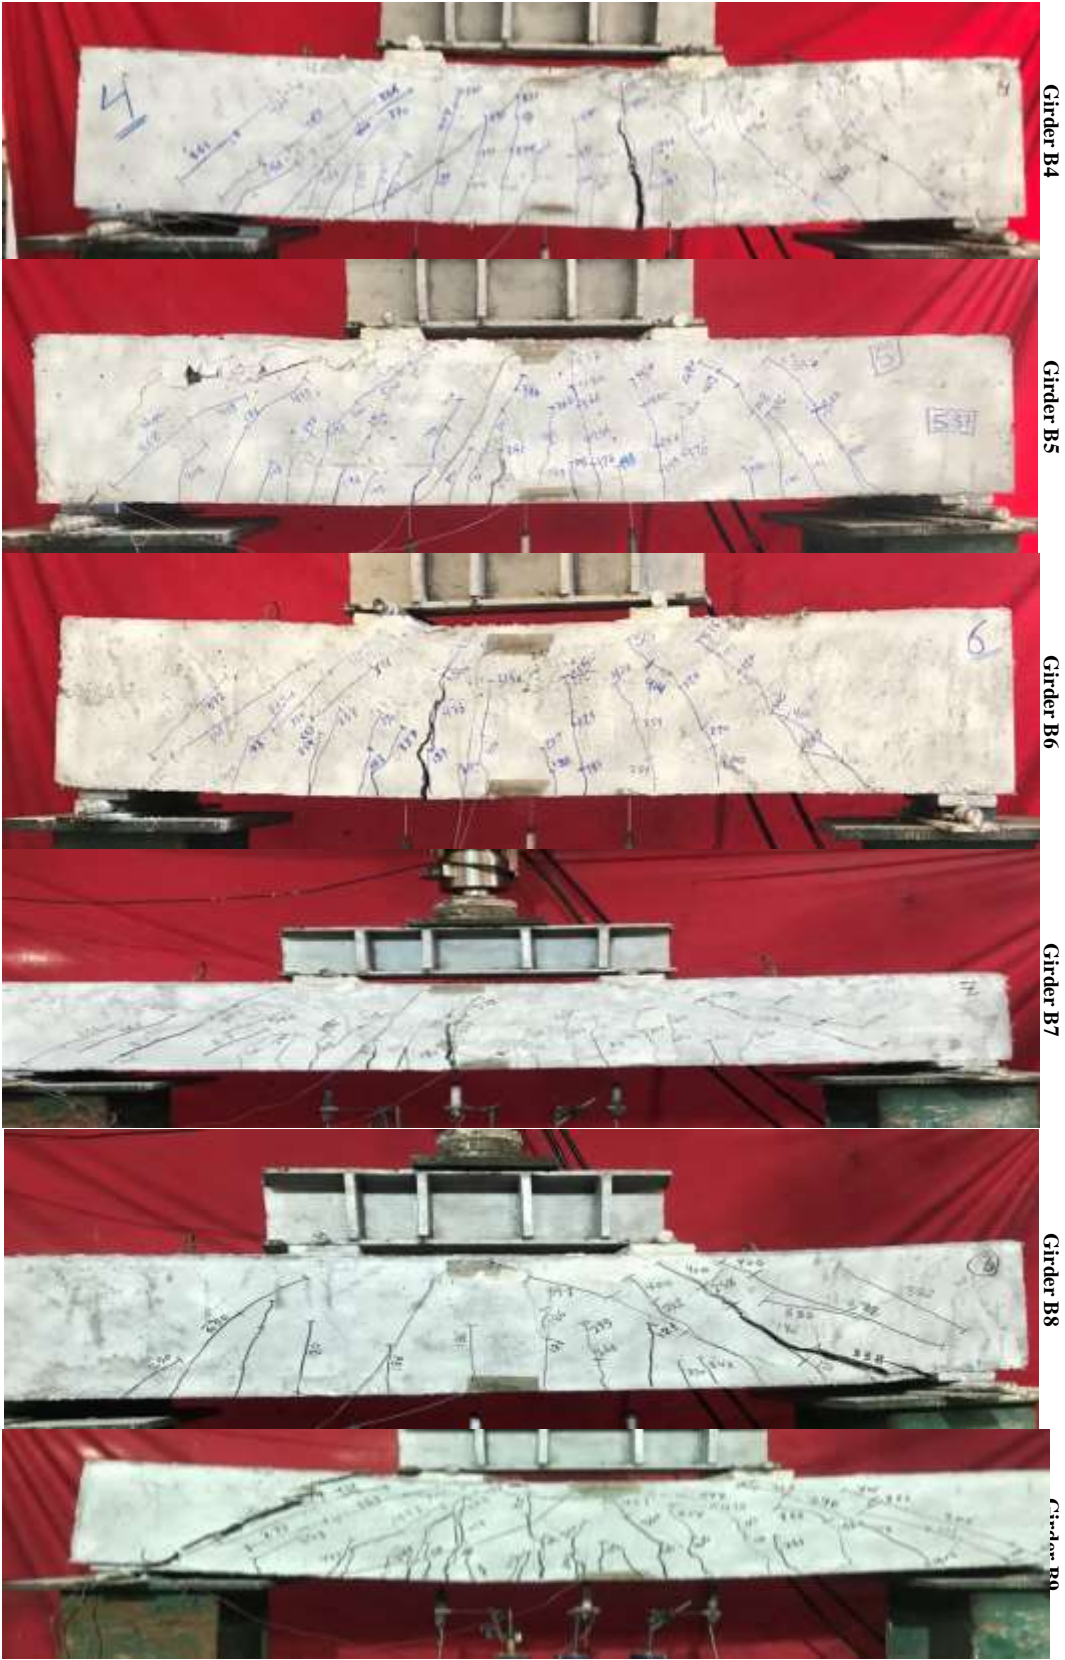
(continued) Cracking patterns for all tested girders.
